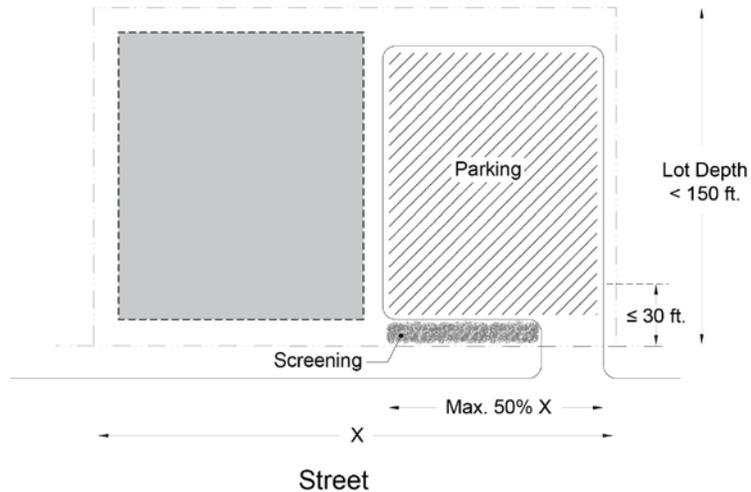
E.1: SURFACE PARKING SCREENING
